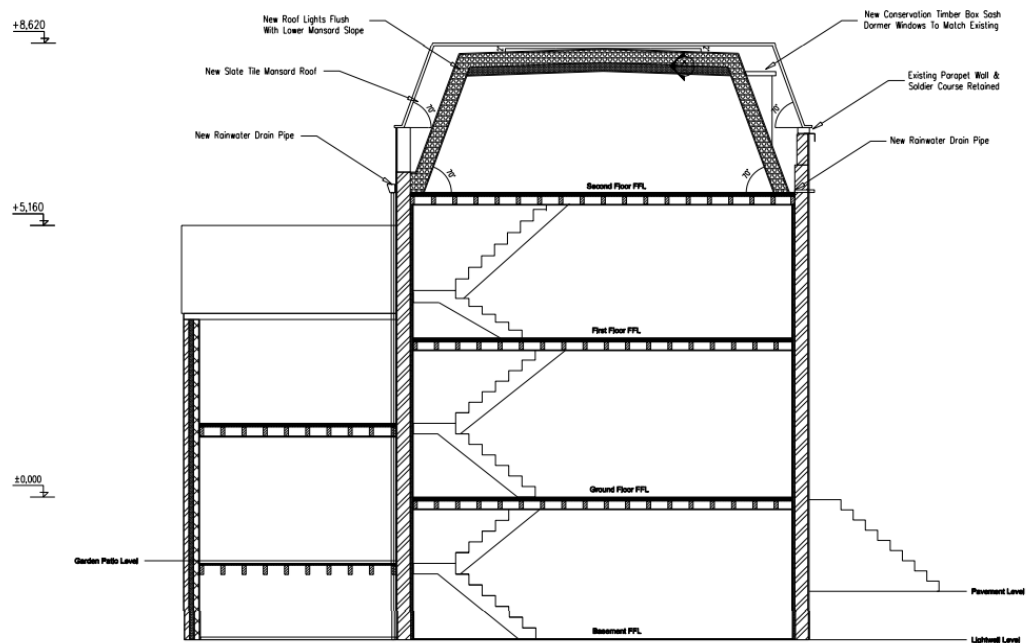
Section of proposed roof extension, compare with similarities in figure 10.
